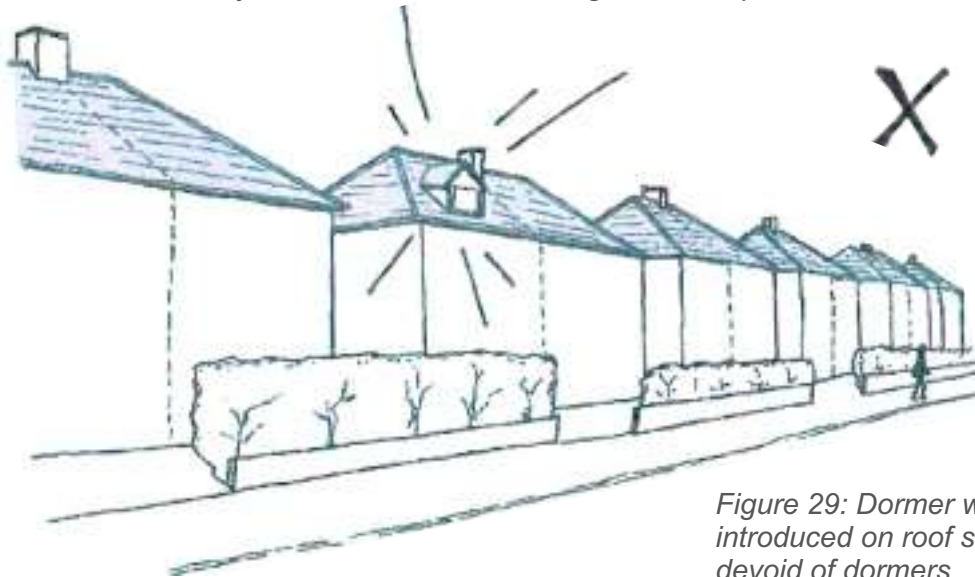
Dormer windows should not be introduced on roof slopes in long runs of roofs devoid of dormers.
